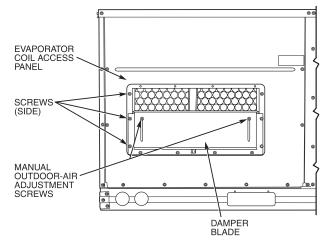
Damper Panel with Manual Outdoor-Air Damper Installed
